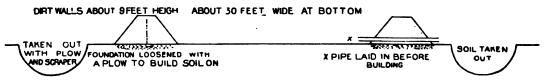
EARTH WATER TANK CONSTRUCTION.
